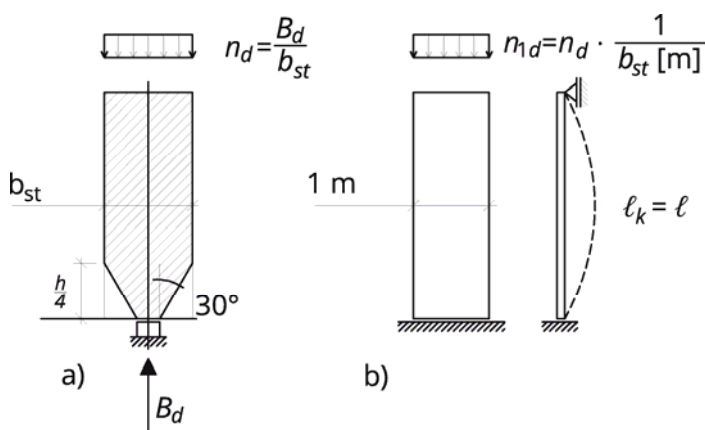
Wall pillar with conversion of the load to one column with a width of 1 m
